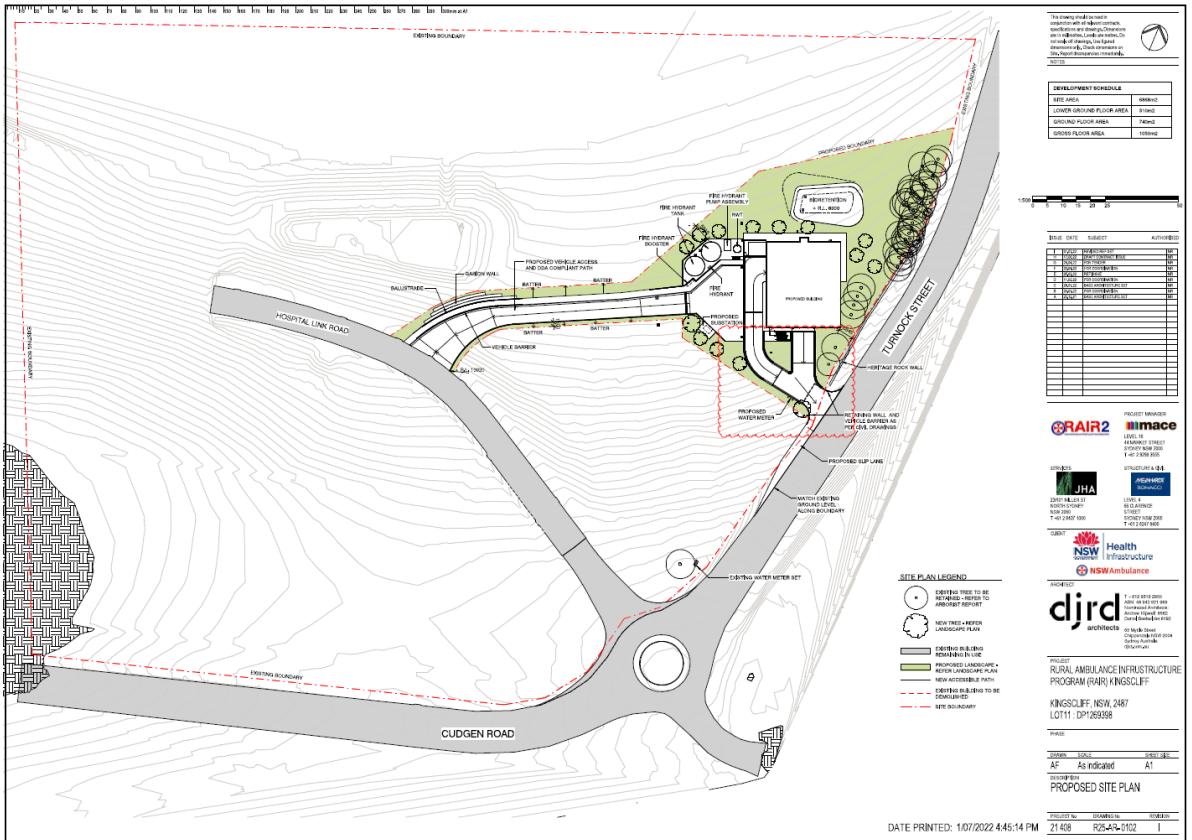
Excerpt from Proposed Site Plan (Drawing R25-AR-0102, Rev. I). (djrd Architects, 1 July 2022).
